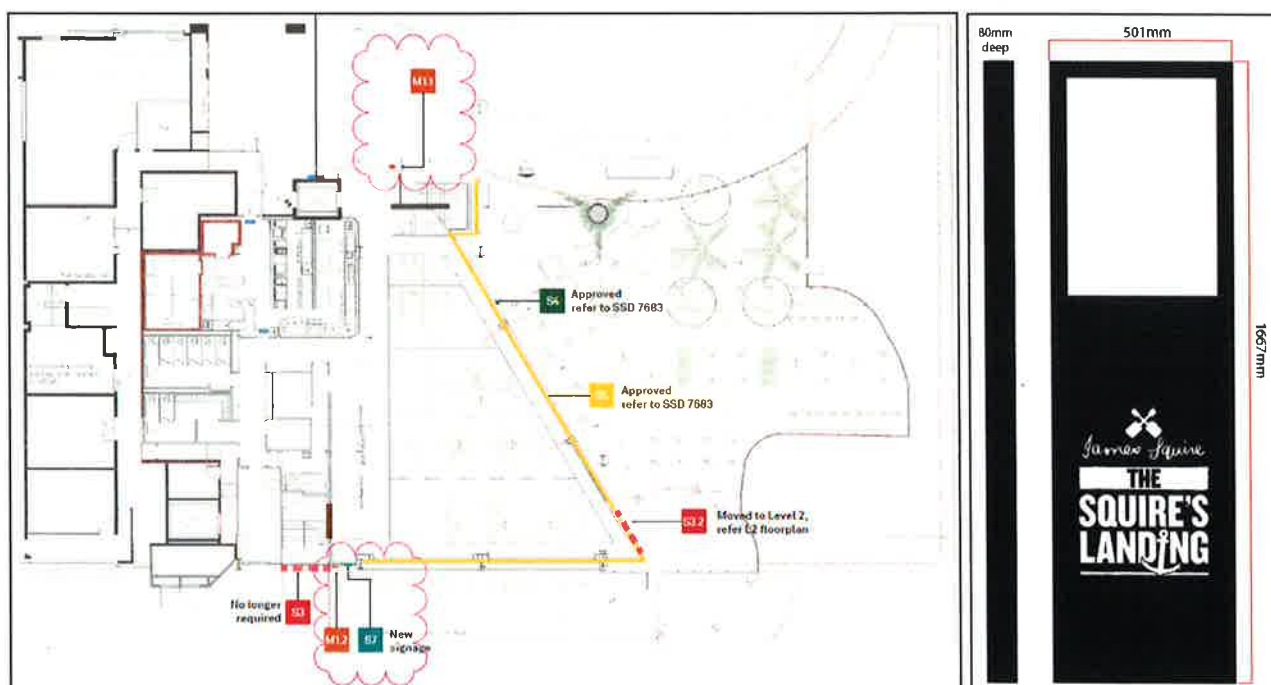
| The locations of the two proposed illuminated, free standing menu signs shown by the pink clouding (left) and the proposed dimensions (right) (Source: Mantle Group)
